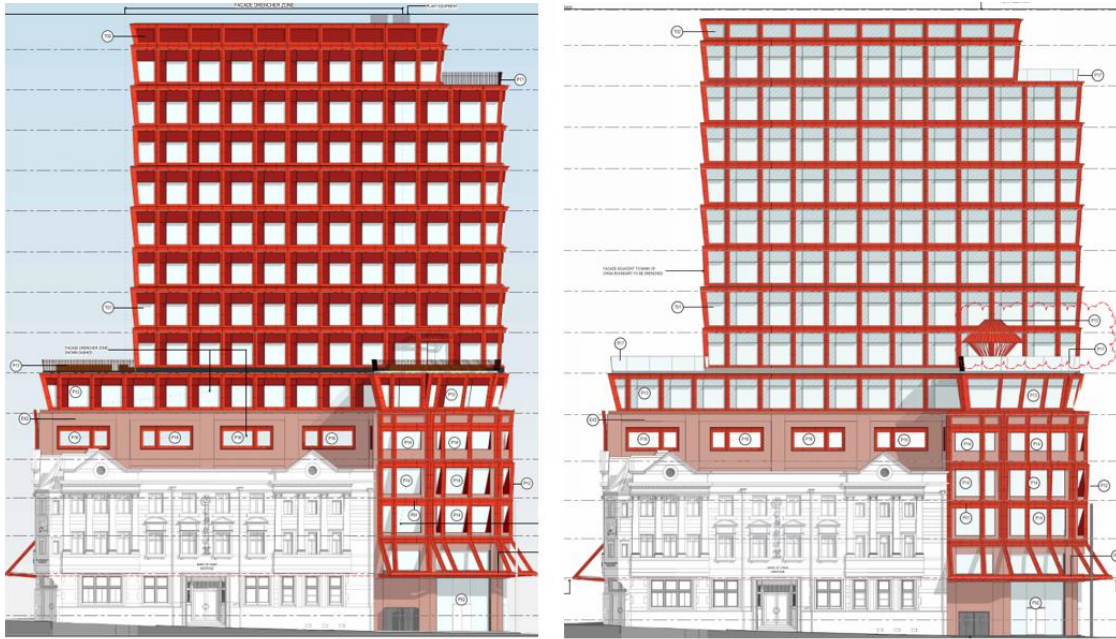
Original and amended architectural drawings (north elevation) showing an overall simplification of the building facades
